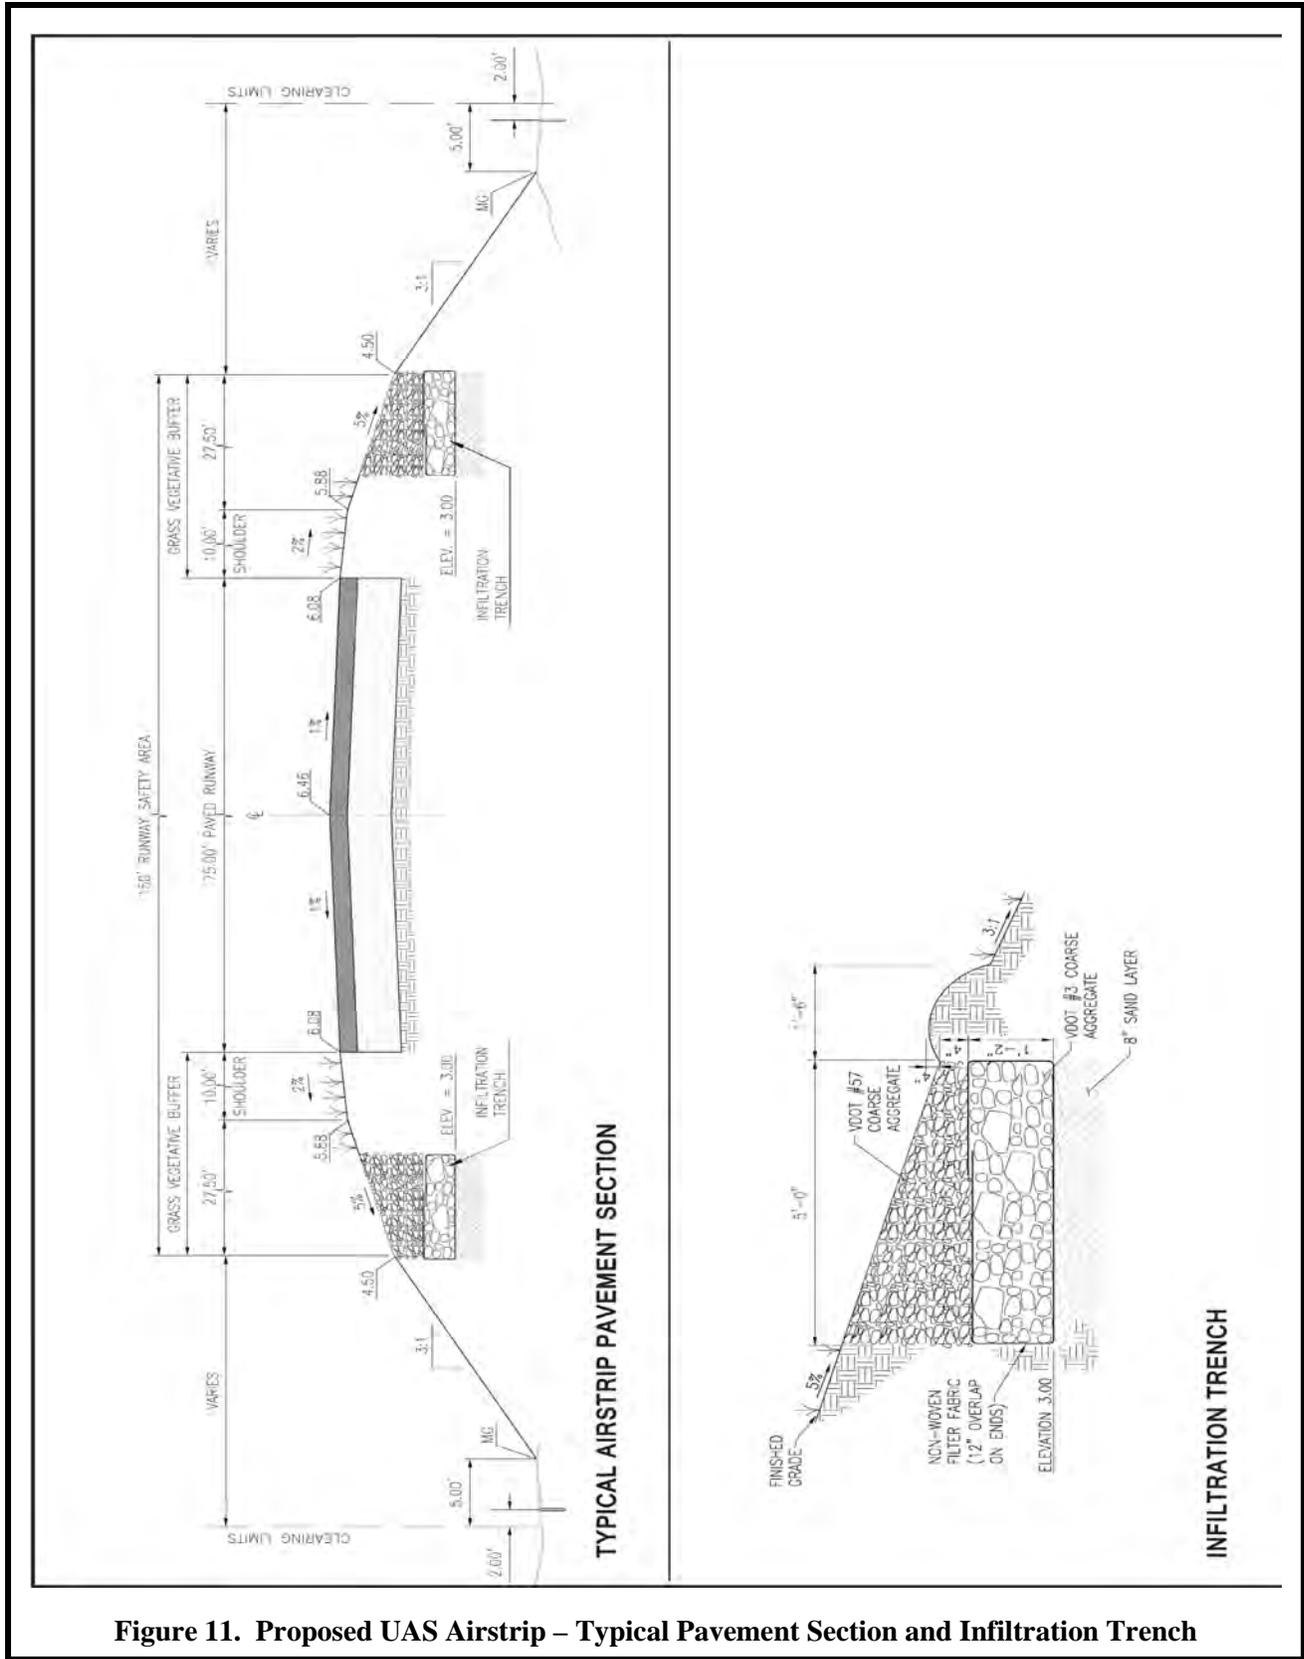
Proposed UAS Airstrip – Typical Pavement Section and Infiltration Trench
